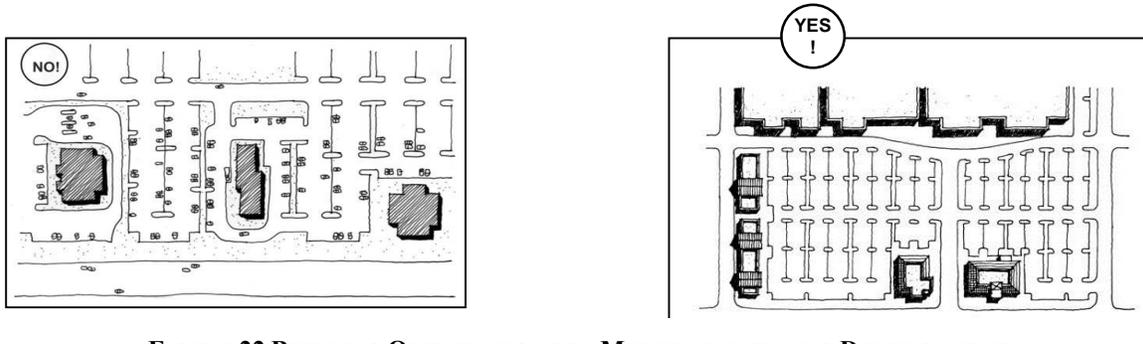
BUILDING ORIENTATION FOR MULTIPLE-BUILDING DEVELOPMENT
